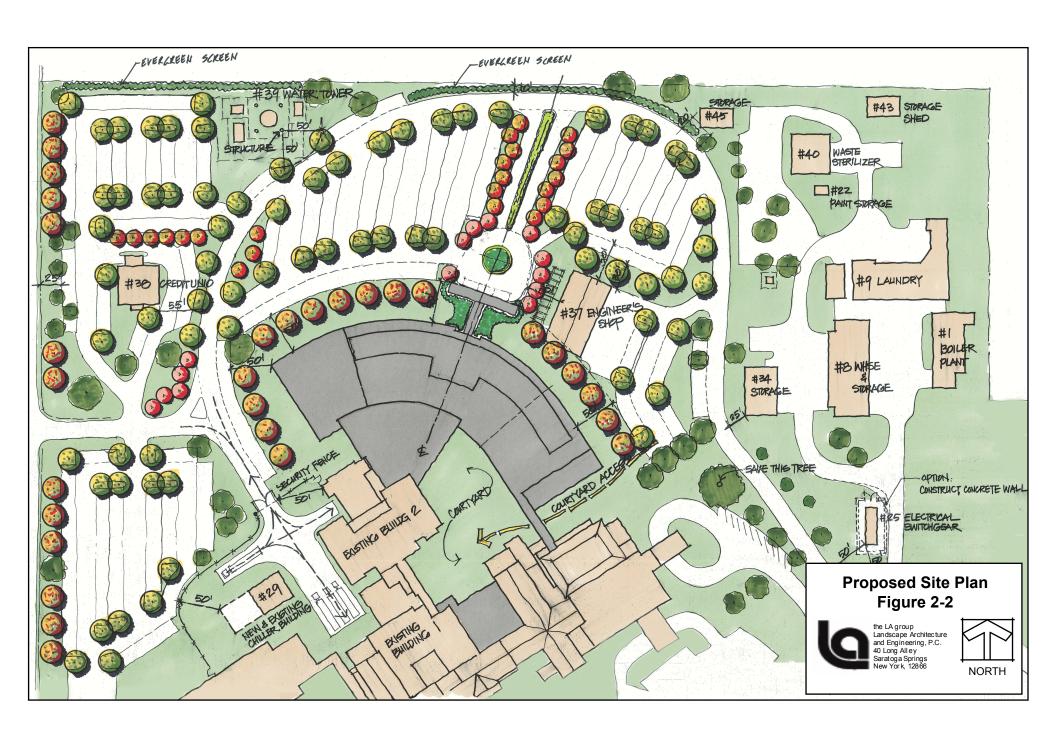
, "Proposed Site Plan," illustrates the proposed Clinical Addition development plan, which includes the renovation of lab and pharmacy space, and development of additional parking areas and new courtyard.
